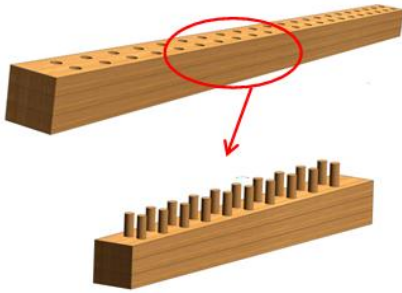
Typical tested adhesive free three-layer beam (assembled through compressed wood dowels)
